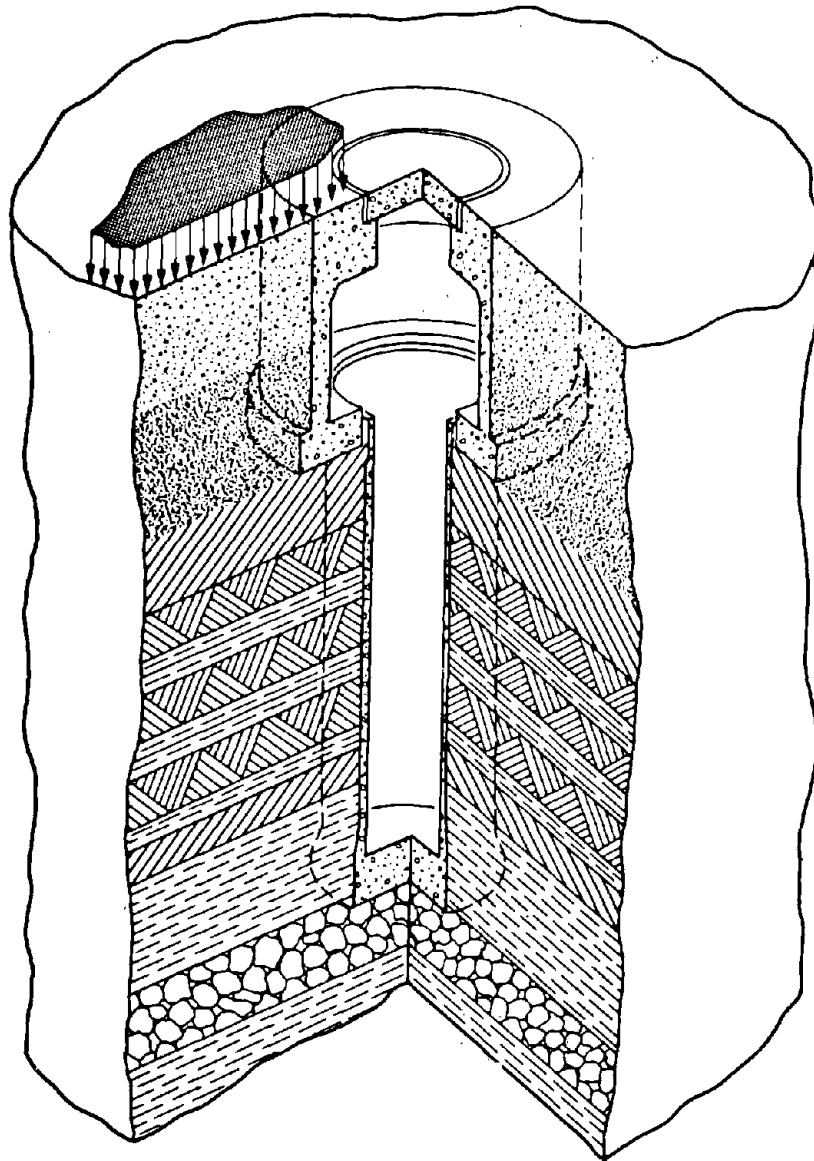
Site of Underground Reinforced-Concrete Structure Subjected to Overhead Blast Loading (Lee-Agabian, 1976)
